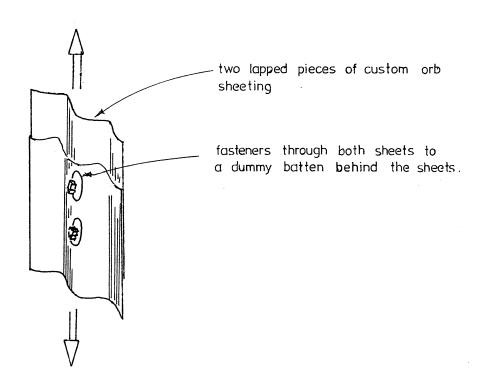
Testing of Sheeting to Batten Fastener with Lap Joint
